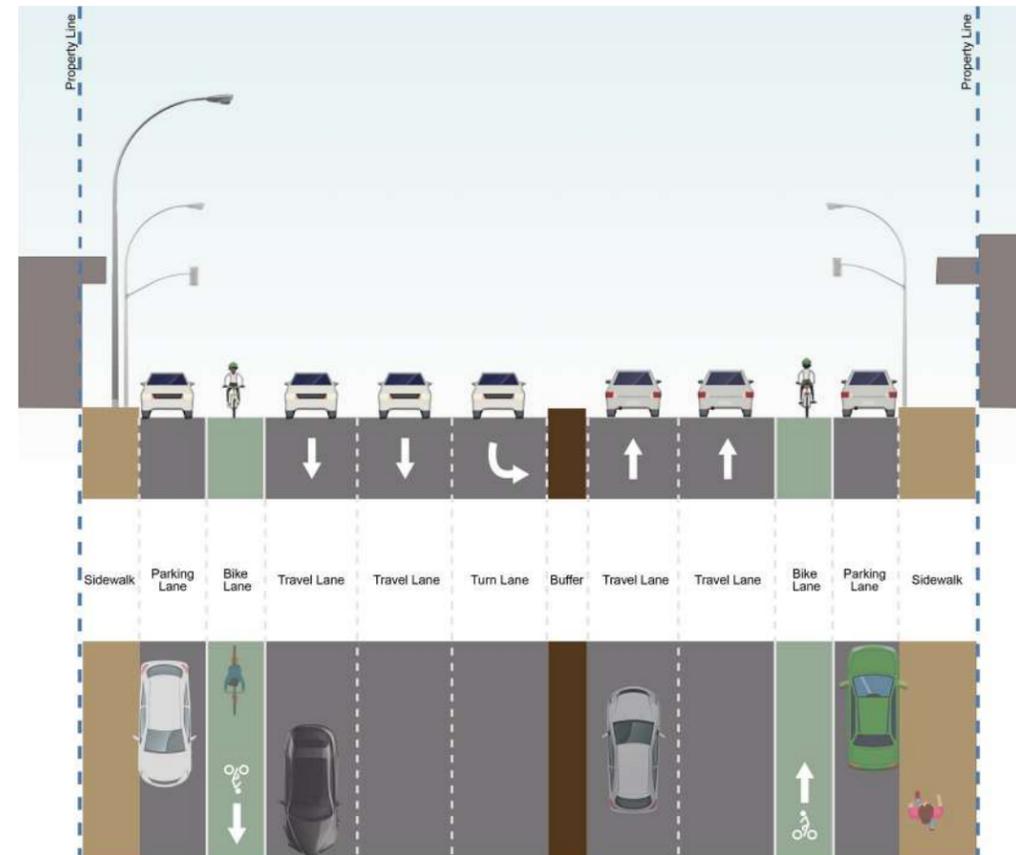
Existing Street Section - E. Ventura Ave. @ S. Orange Ave.
